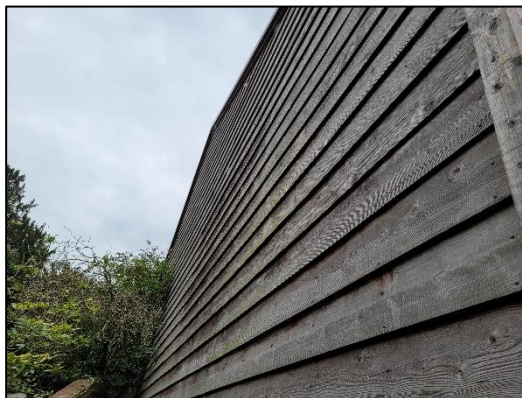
showing a typical view of the tight-fitting wooden cladding that covers three sides of the building.
